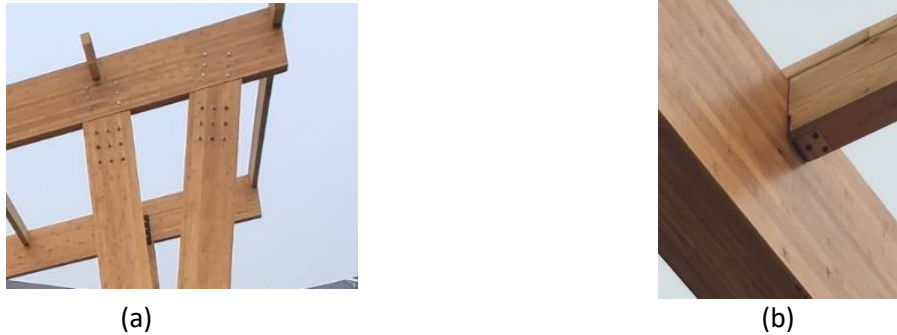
Connections: (a) between beams and columns; (b) between purlins and beams.
